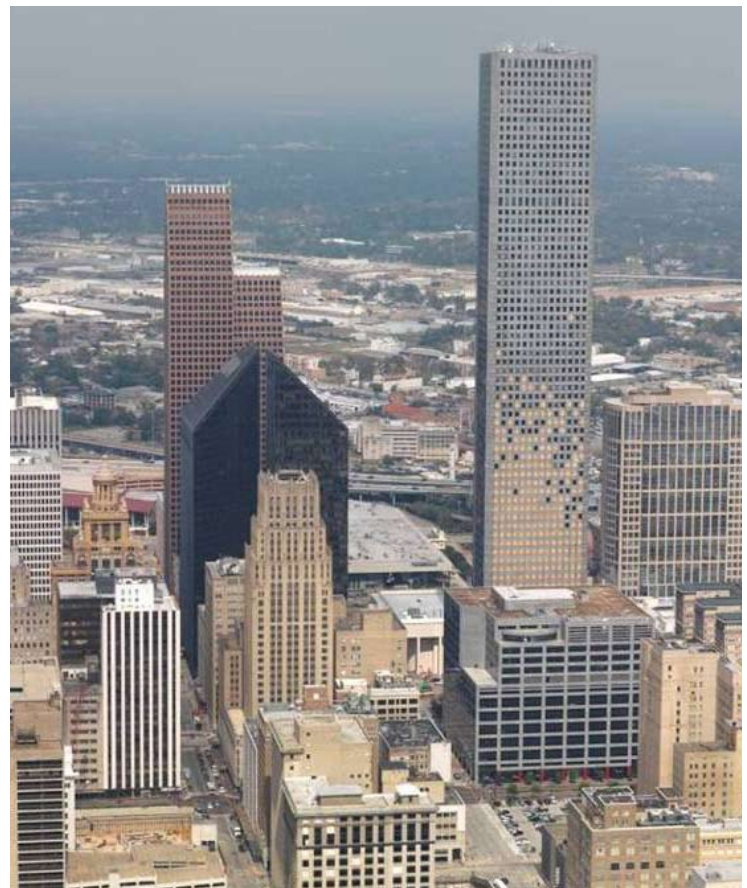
Downwind View of Chase Tower (Southeast Face) with Parking Garage in Foreground. (Photo by EQECAT/ABS Consulting)
